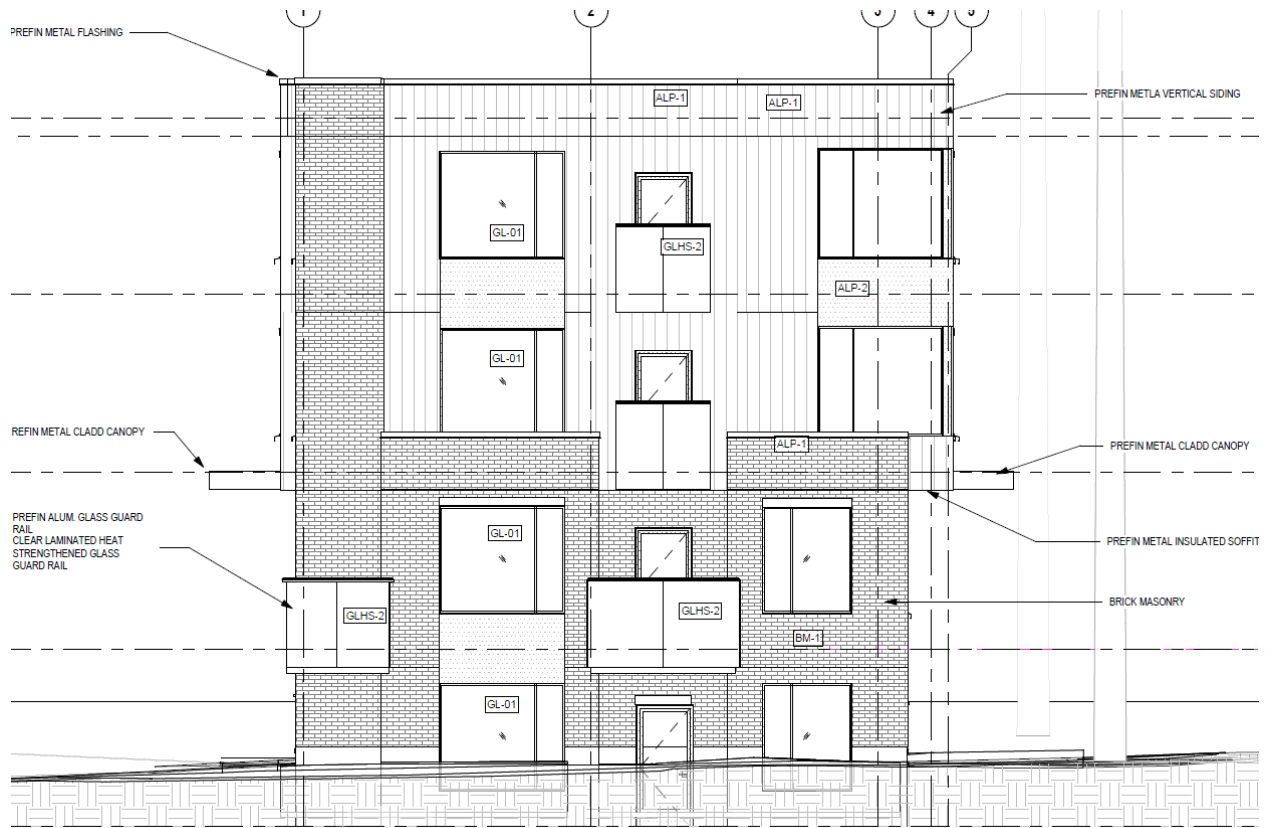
455 McArthur Proposed Development. Front Elevation Architect: Hobin Architecture
